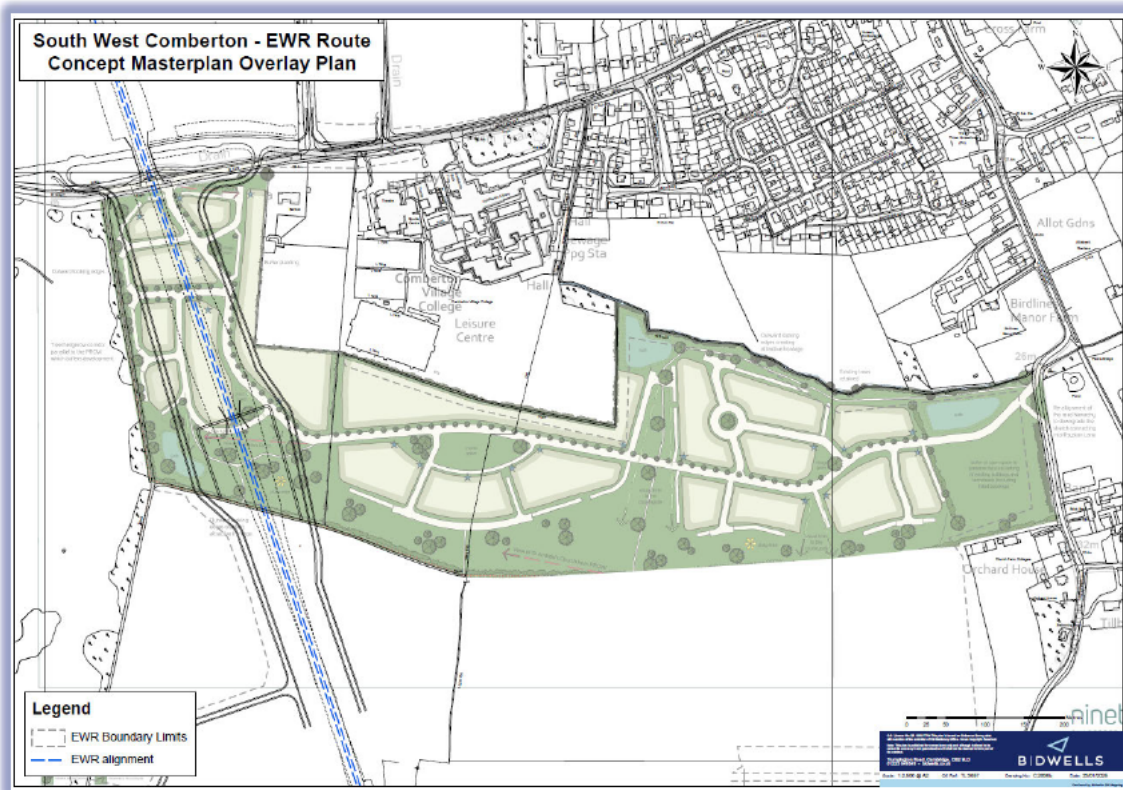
Overlay Plan showing EWR Track Alignment and the Concept Masterplan
